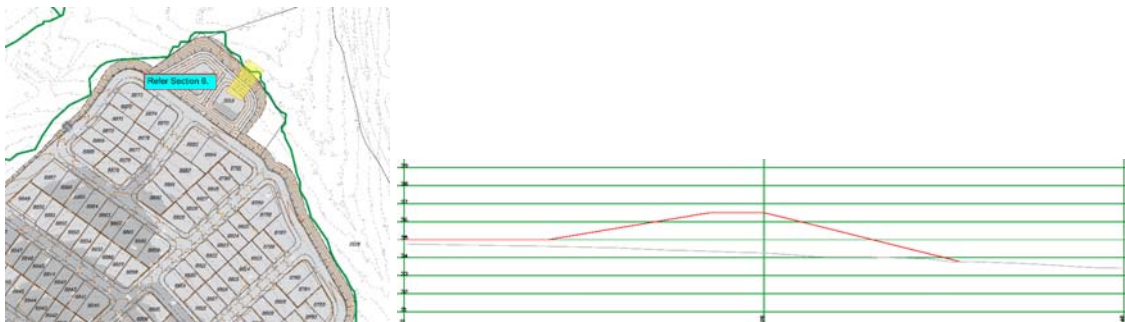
Section 7: P8 Stage 823 Culvert/ Creek Crossing
